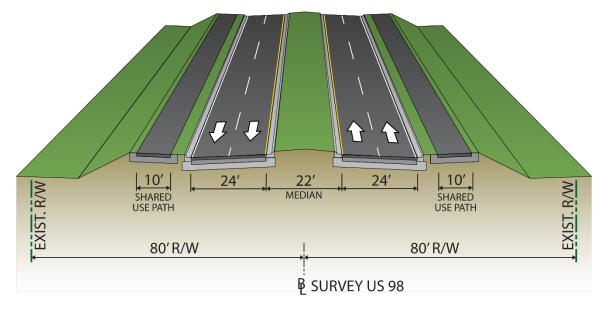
Proposed US 98 C3R (Suburban) Typical Section
